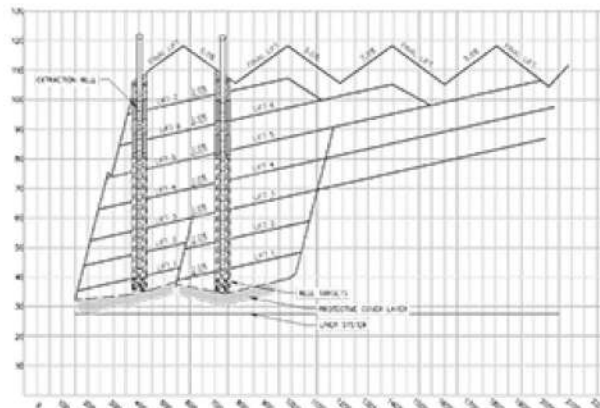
Tie-in to leachate system riser installed prior to waste placement
